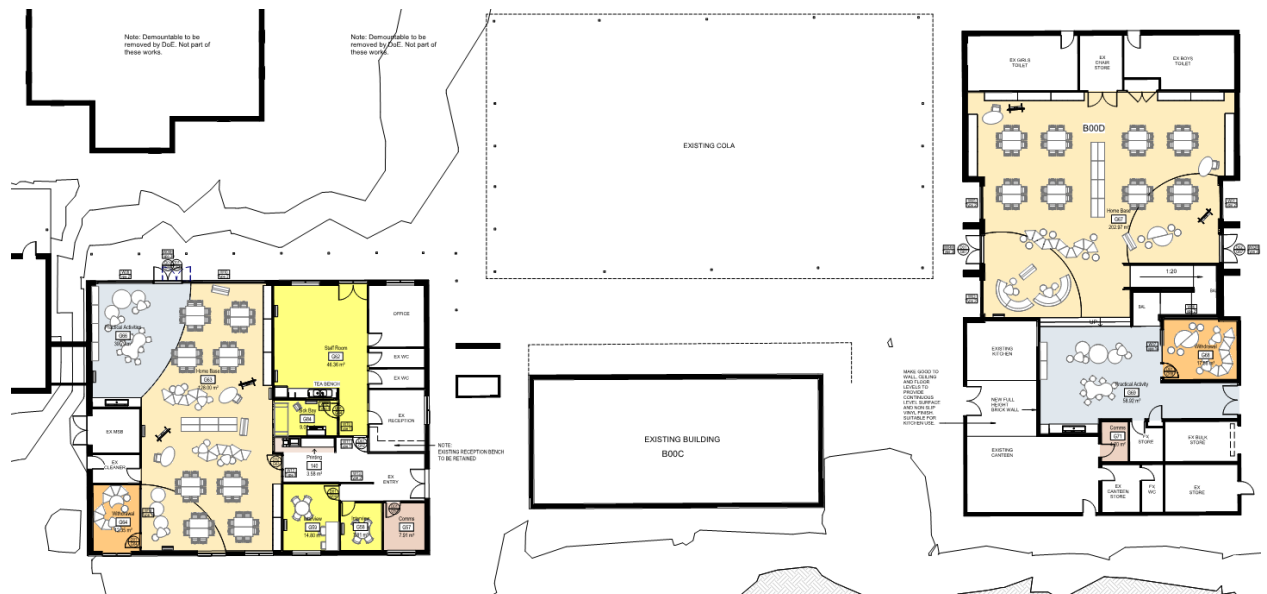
Proposed ground floor plan of admin block B (left) and communal hall D (right) showing the proposed internal refurbishments. (Source: Conrad Gargett)
